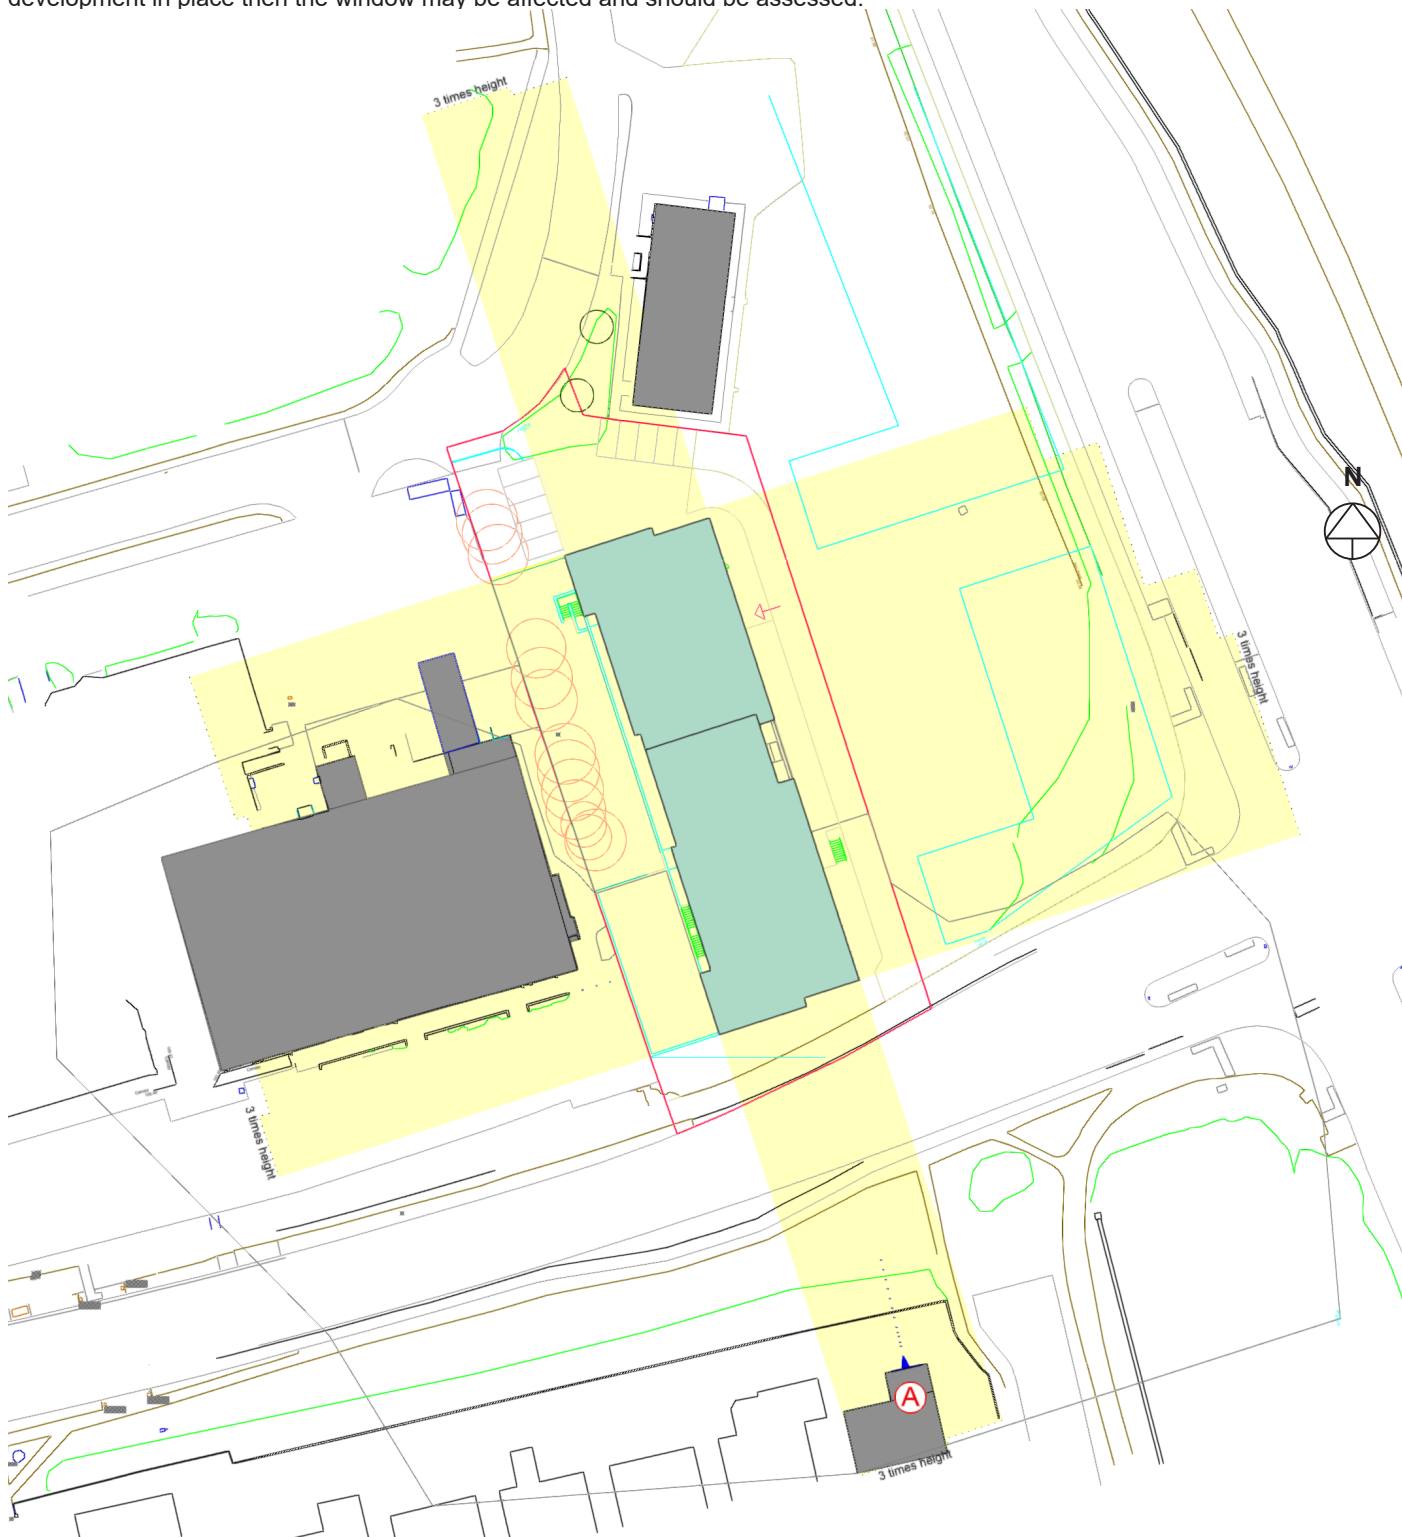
Proposed site plan showing the zone of influence (3 times the height of the proposed building) and direction of the window wall of adjacent residential properties.
